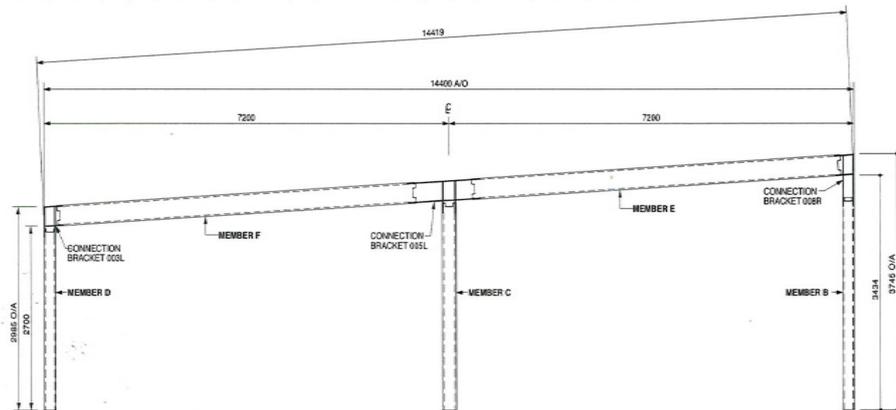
Portal frame with hollow-flange Long Span Beam and connectors
